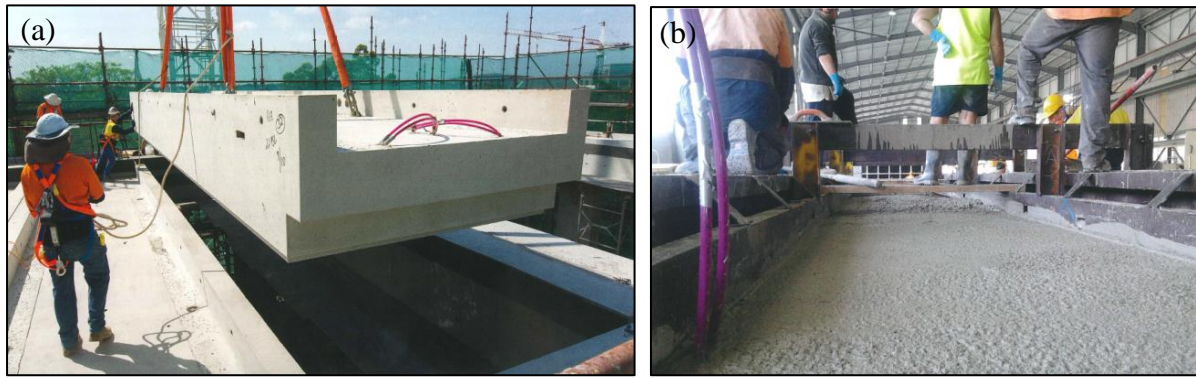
(a) Placing of precast geopolymer concrete panel, and (b) Concrete finishing in the precast factory (Wallis, 2013)
